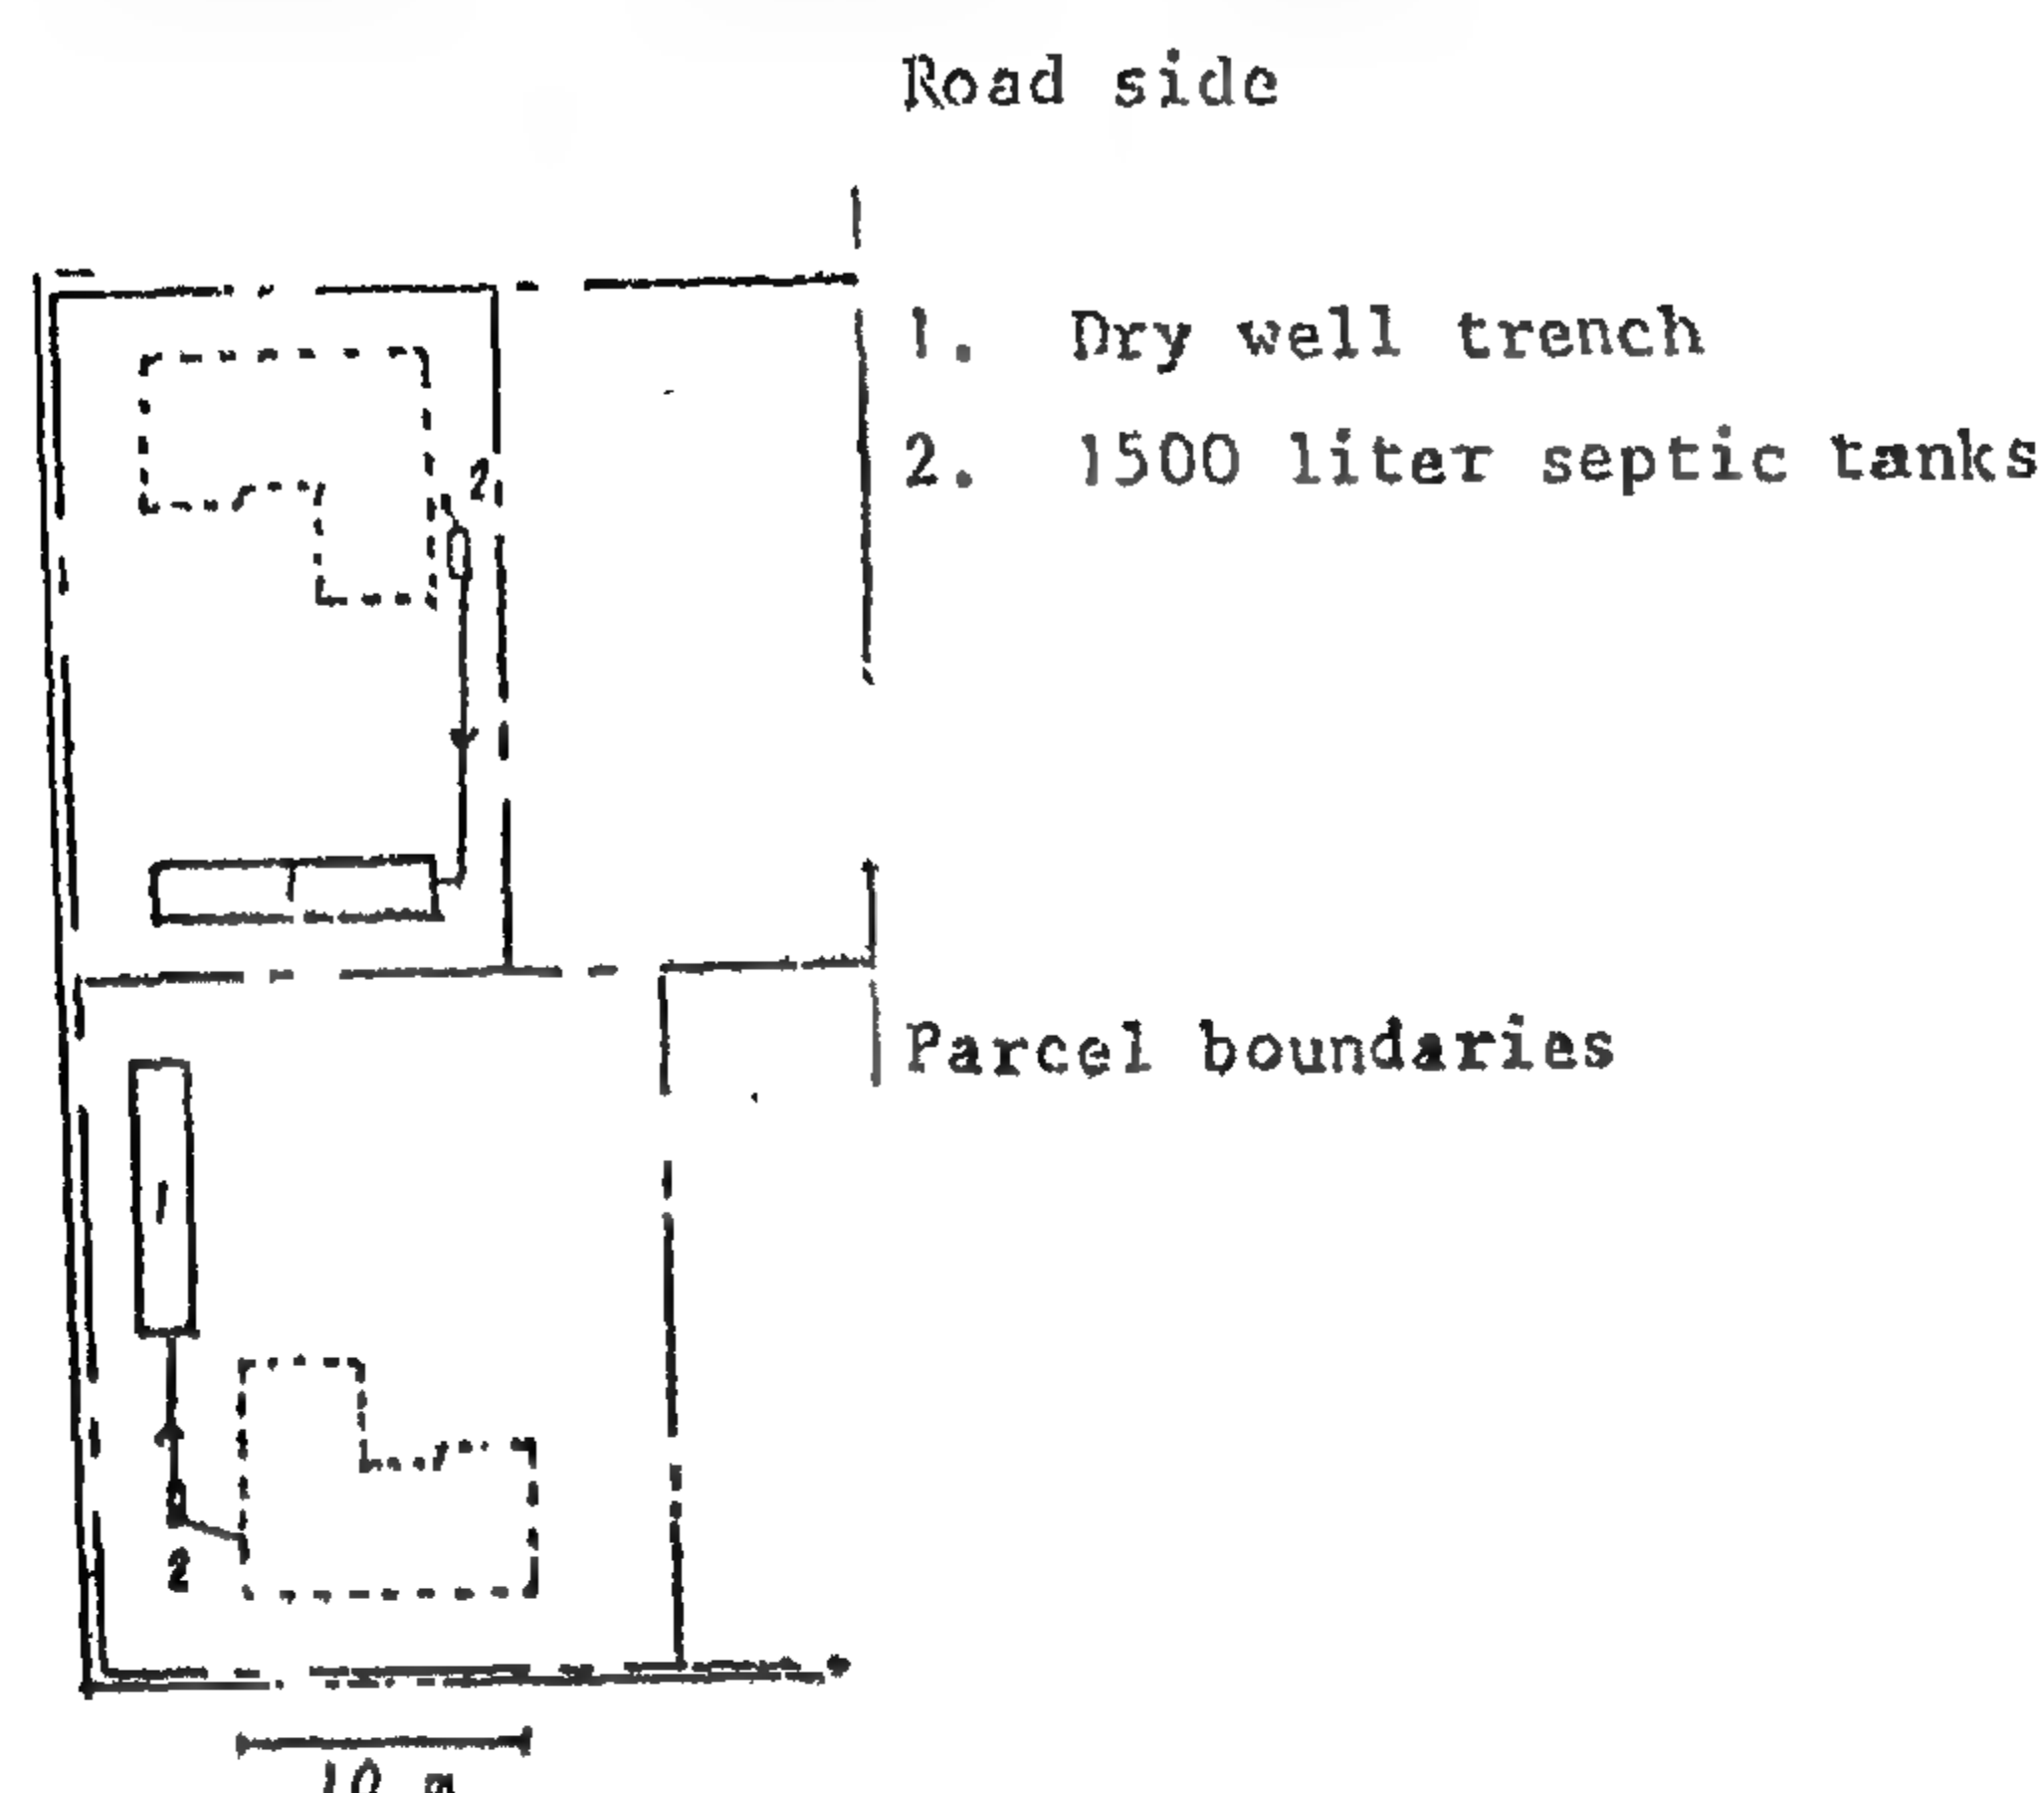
Examples of the layout at the ANEHO-NLESSI site
